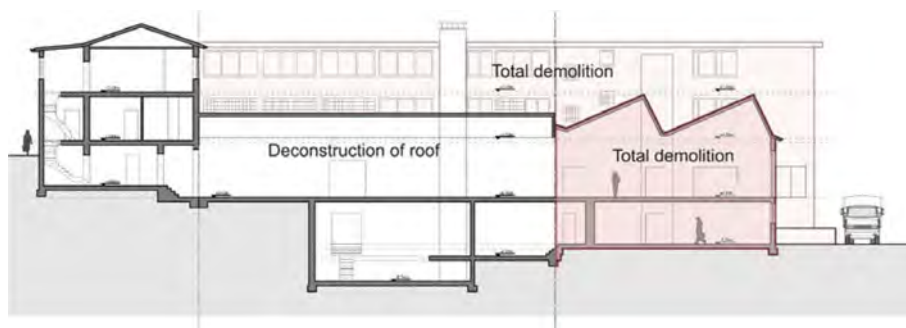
Overview of demolition and deconstruction. An office-building was demolished while the roof of an earlier fabrication hall was deconstructed and reused for the new building.
